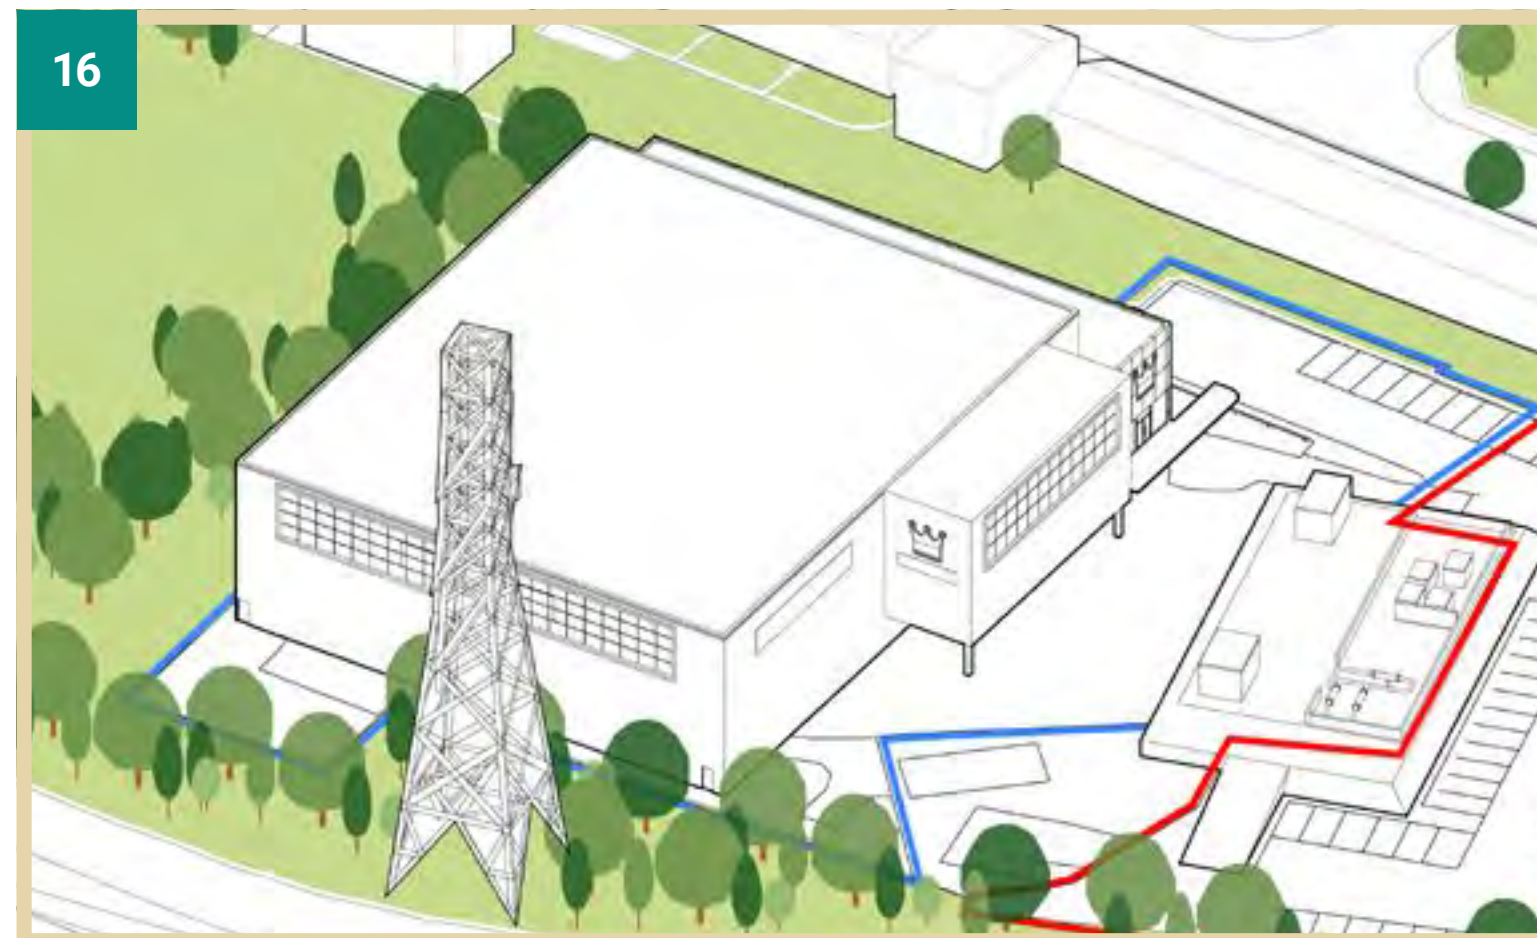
ADJOINING SITE OUTLINE CONSENT 3D VIEW
